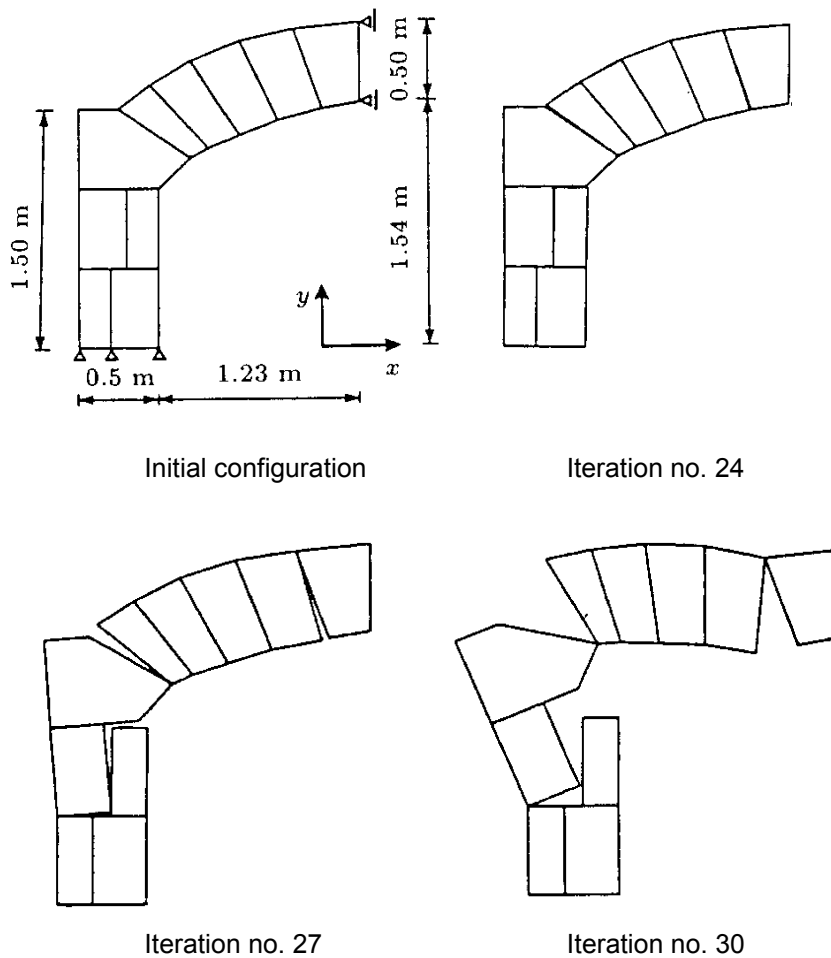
Failure mode of a masonry arch (Mamaghani et al., 1999).
